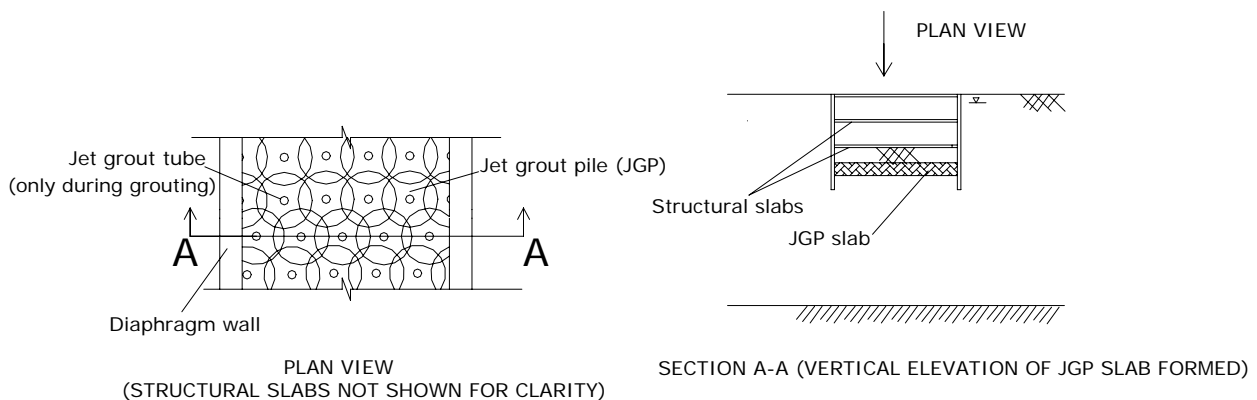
JGP grid, completed piles viewed in plan and elevation (slab).
